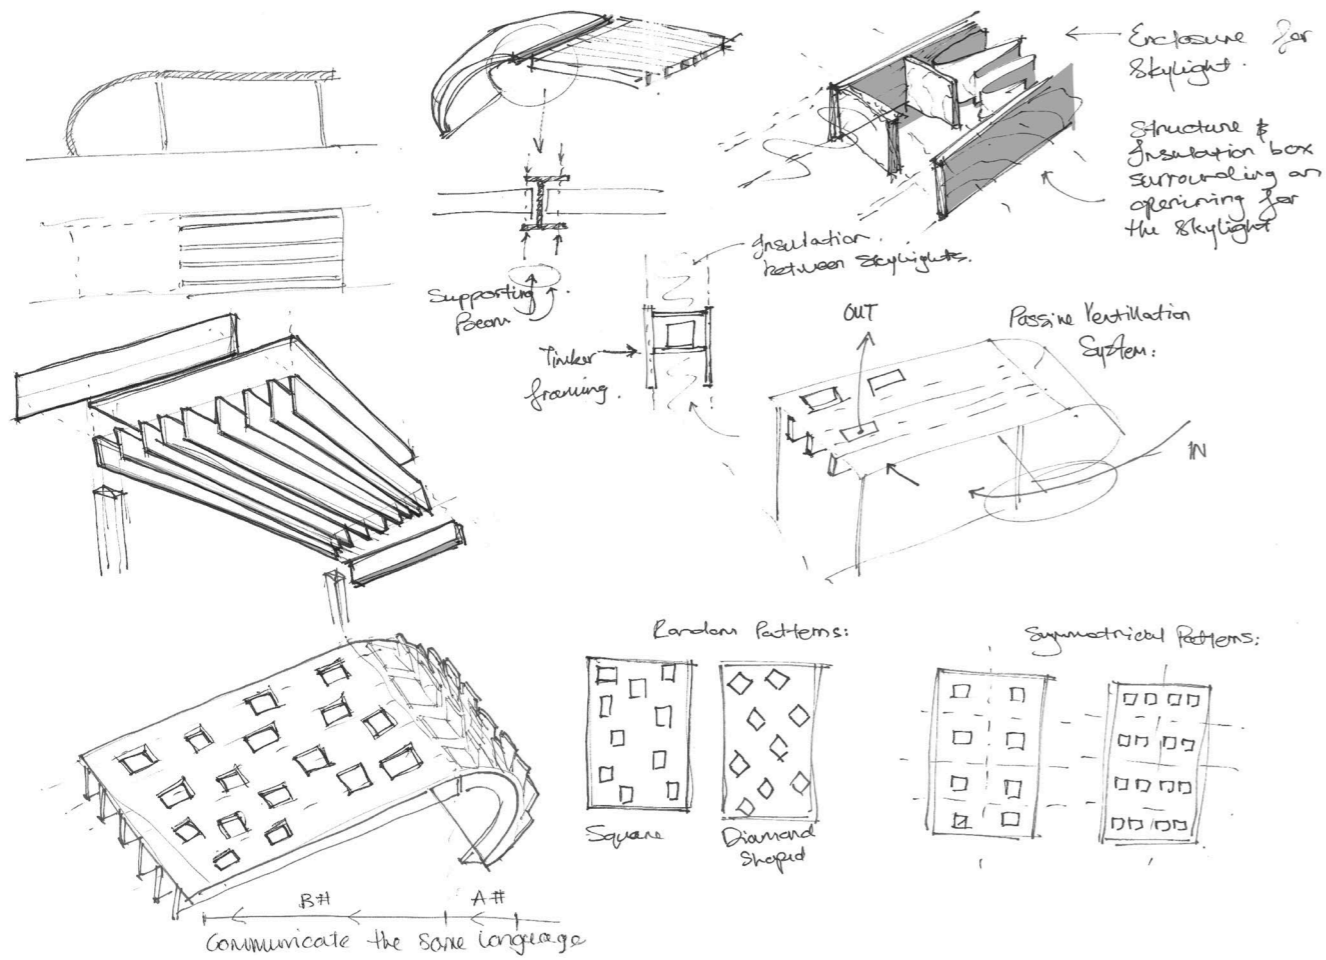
Facade details and exterior concepts through hand-drawn sketches.
